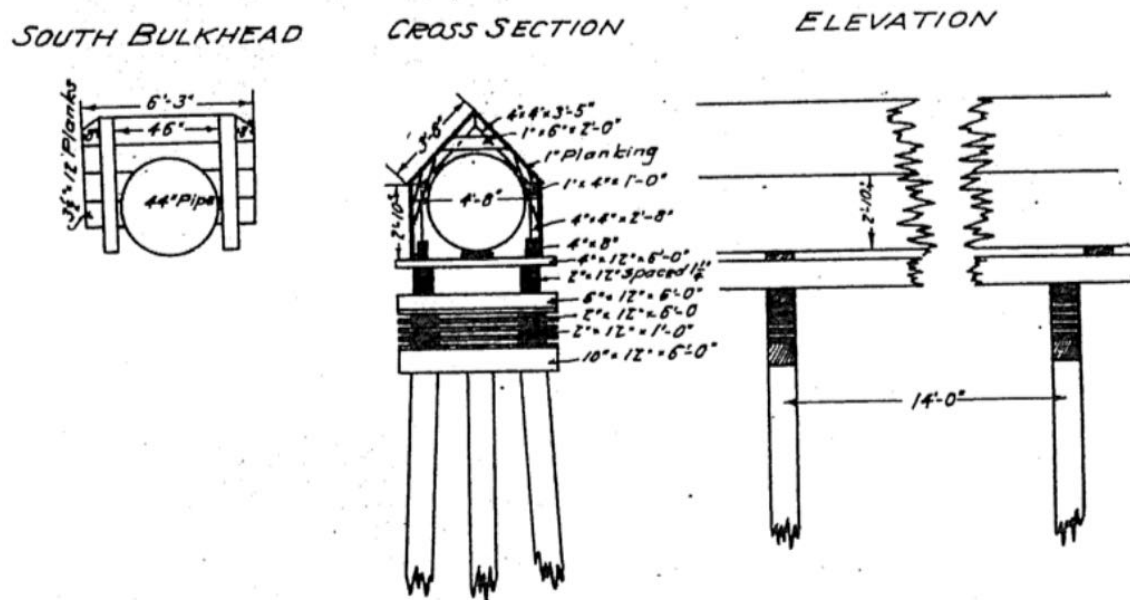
Crystal Springs Trestle 12 (3,039 feet long) (SVWC Drawing)
